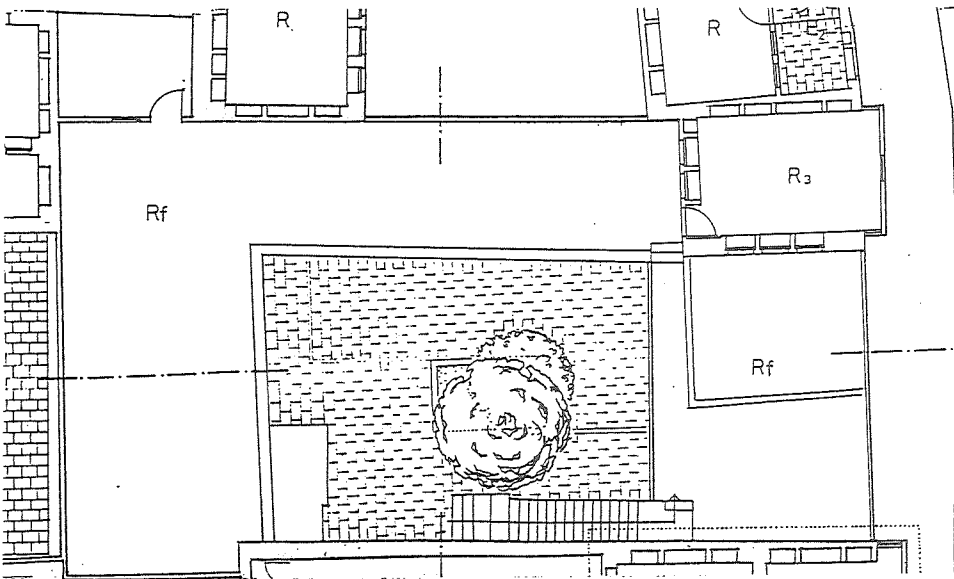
First floor plan of "selamlık" part ("katirhane") of Yorgancı House.
